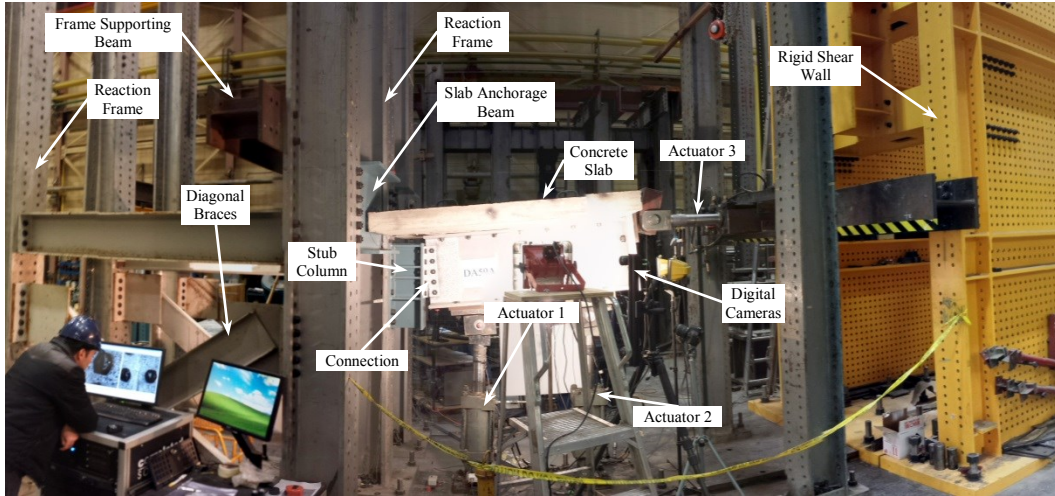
Assembly of Test Set-up and Position of Test Specimen Segments
